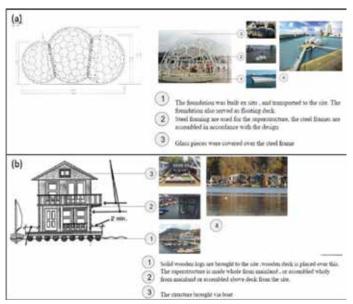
(a) Plan and construction stages of Rotterdam Flotels; (b) Construction stages of Rotterdam Flotels
